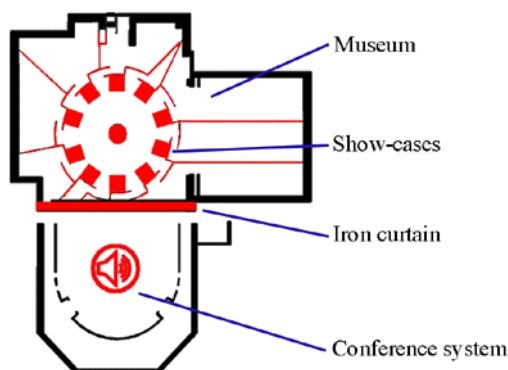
Floor plan of «Parsifal01» at Schauspielhaus Graz.
